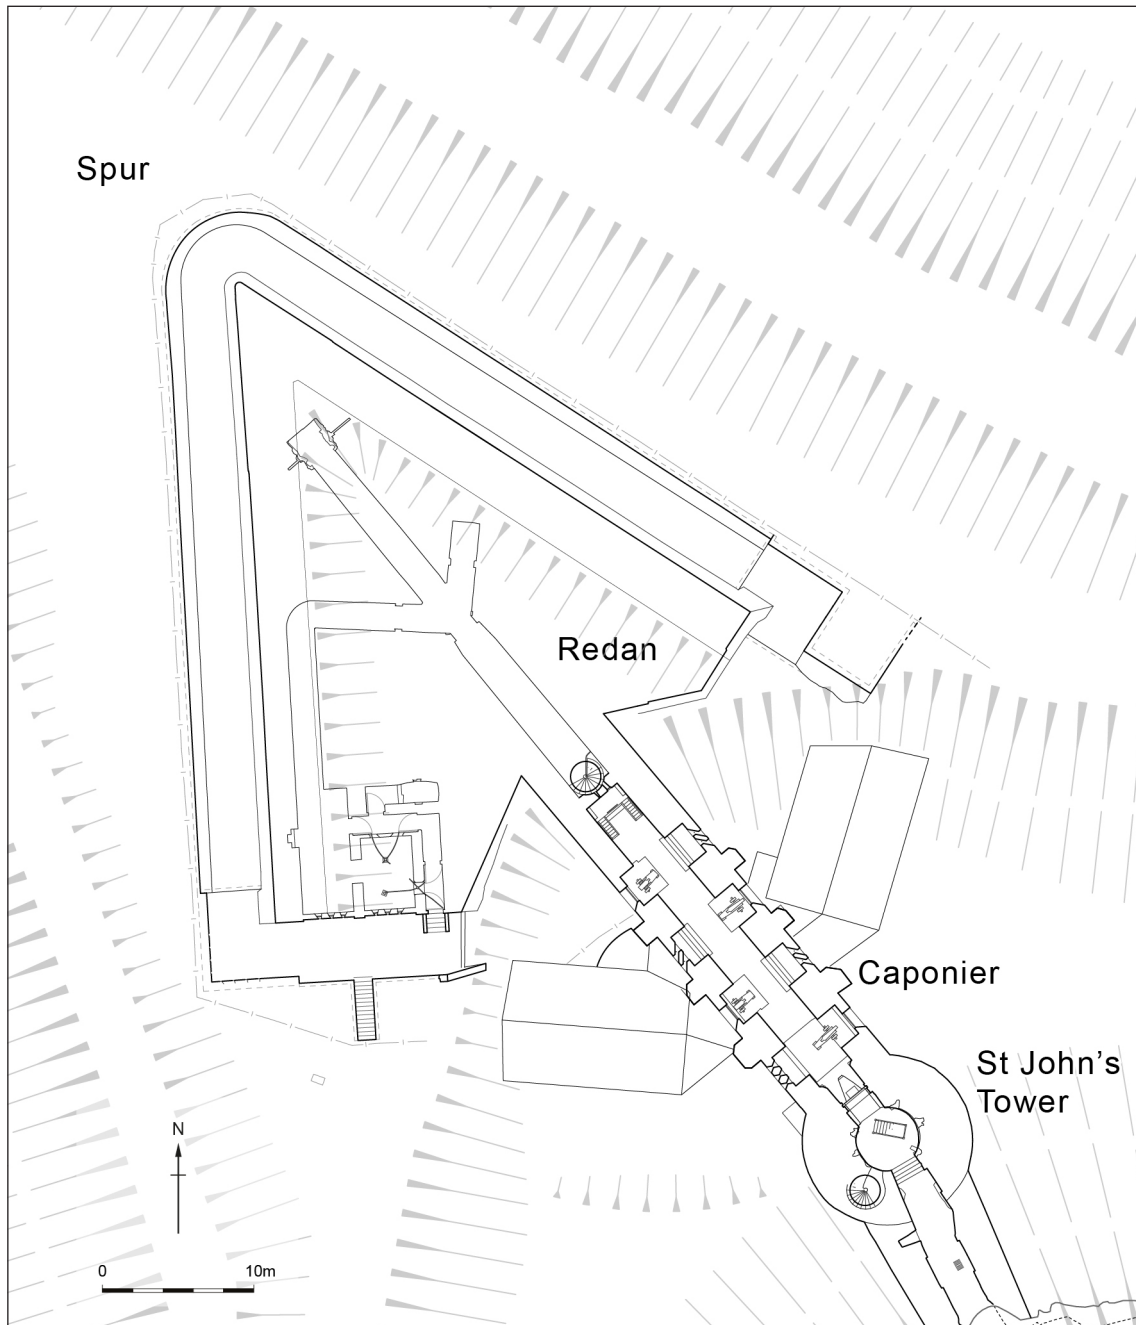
Plan of Spur, redan, caponier and St John's Tower.
